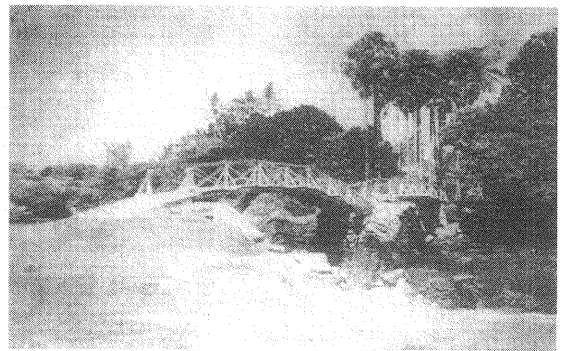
Situation of Butterfly Bridge before damage of tsunami waves
